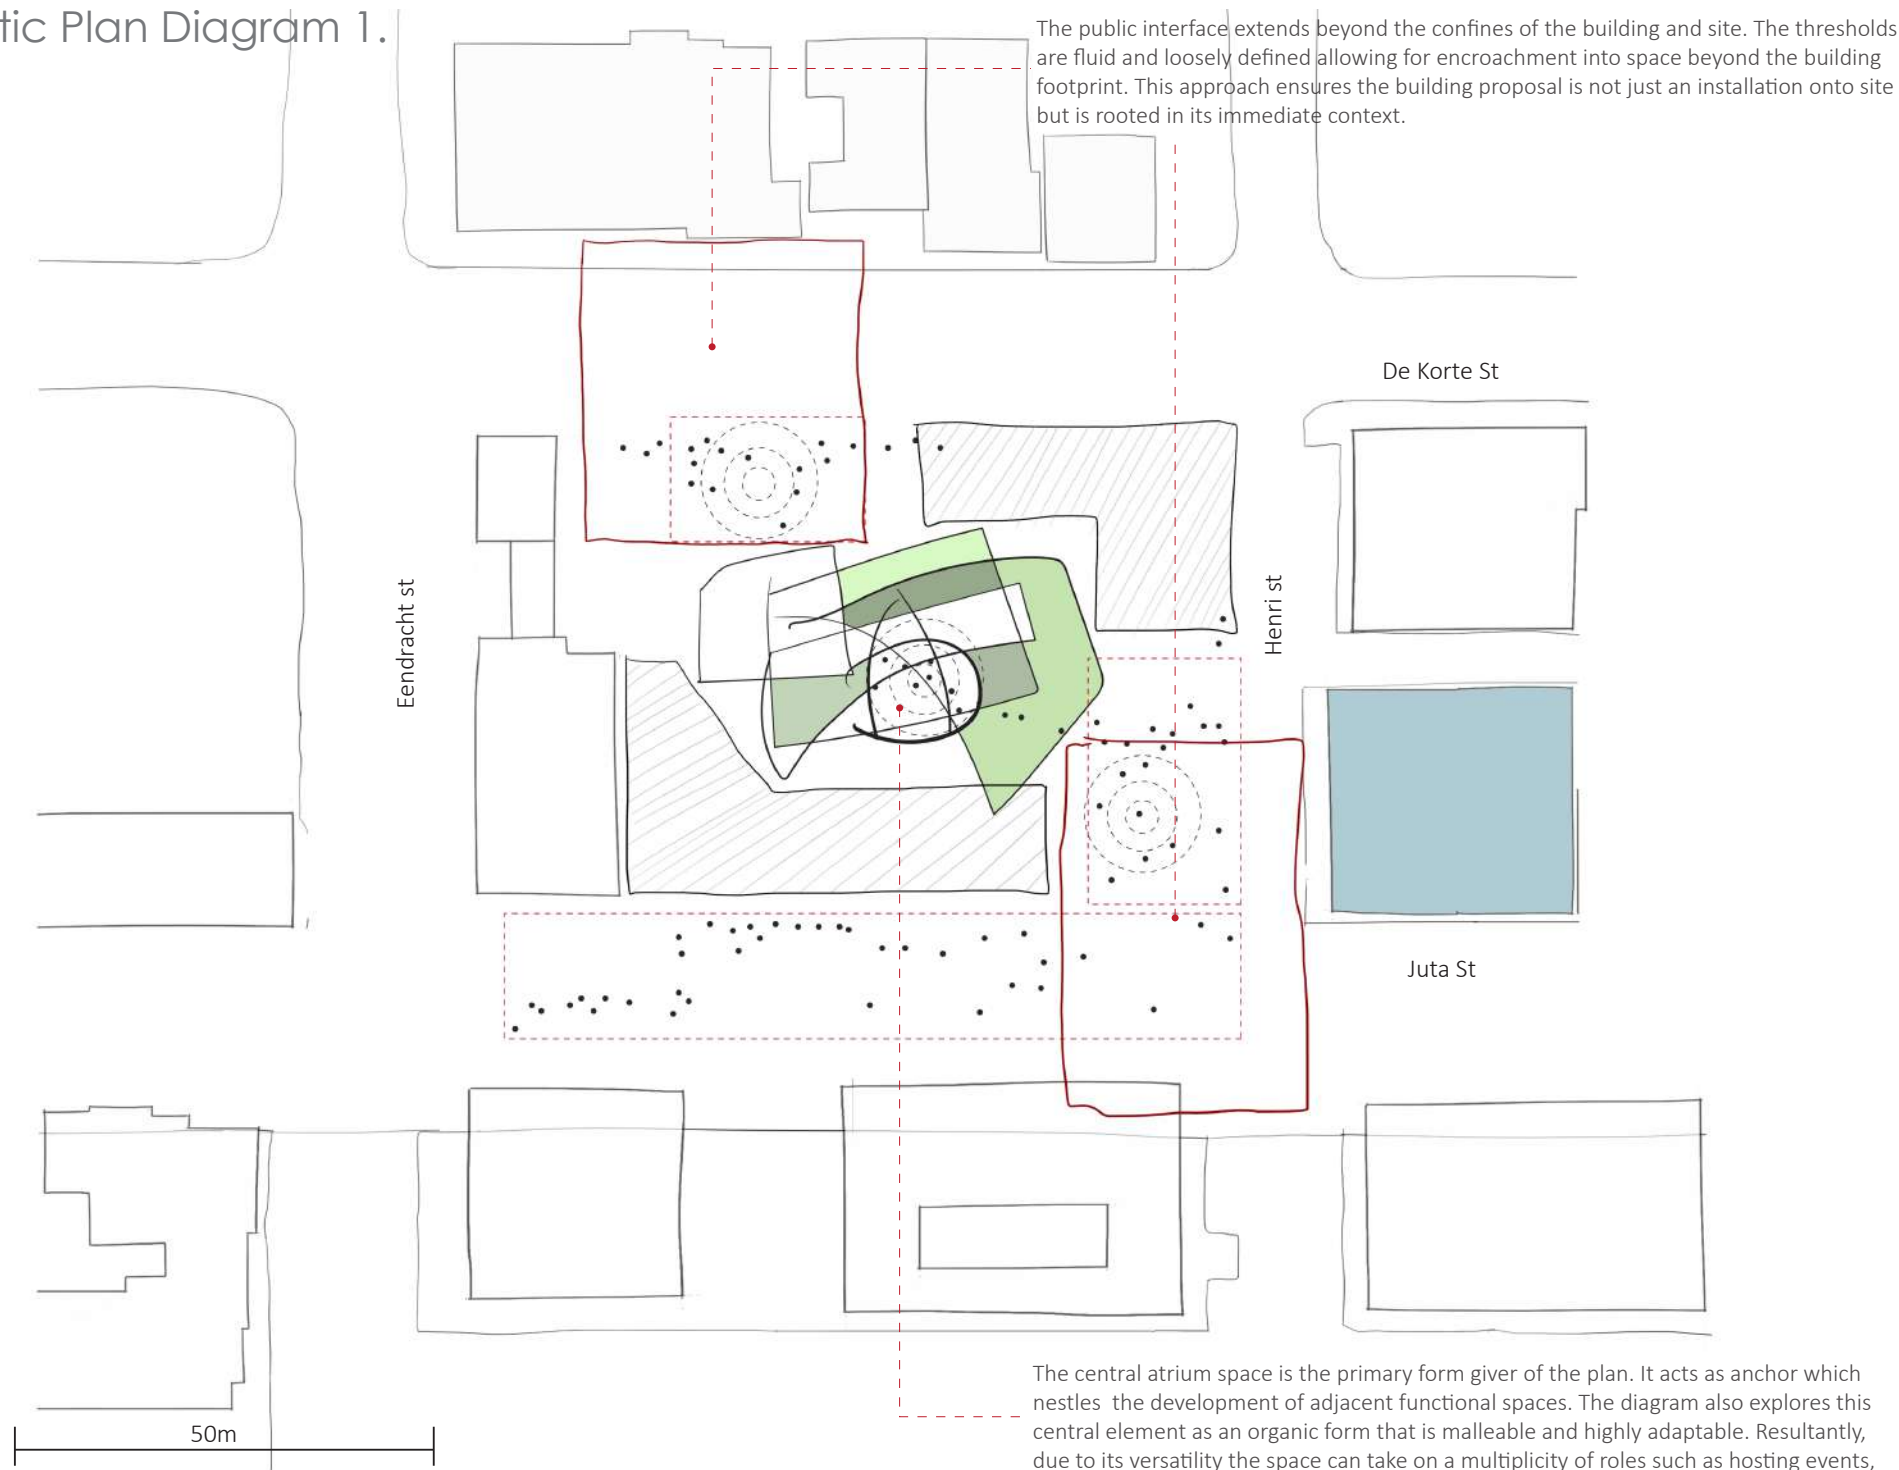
(iv): Diagram of Schematic Plan 1, Exploring Layout , (Author 2020).
